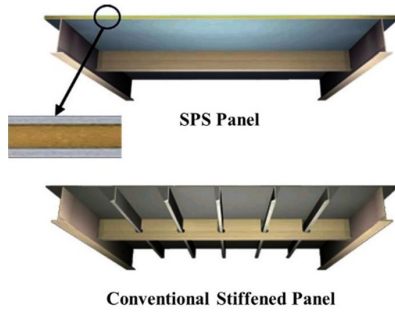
A general structure arrangement of sandwich panels and conventional stiffened panels (SPS Technology, 2020)
